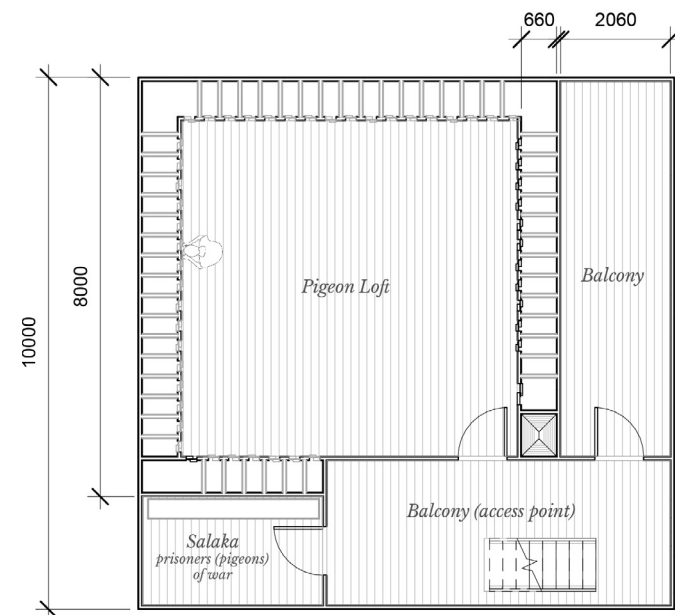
Plan of a 10x10 Pigeon Tower loft space. Drawn by author
